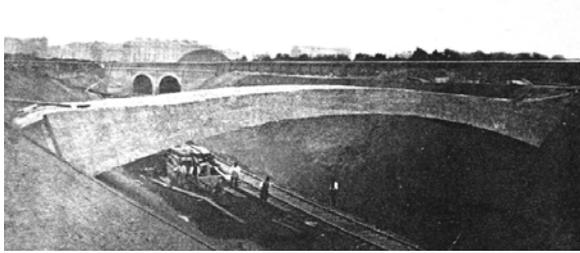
One of the first recorded concrete bridges, Fowler, 1869, England. (The Railway Gazette)
